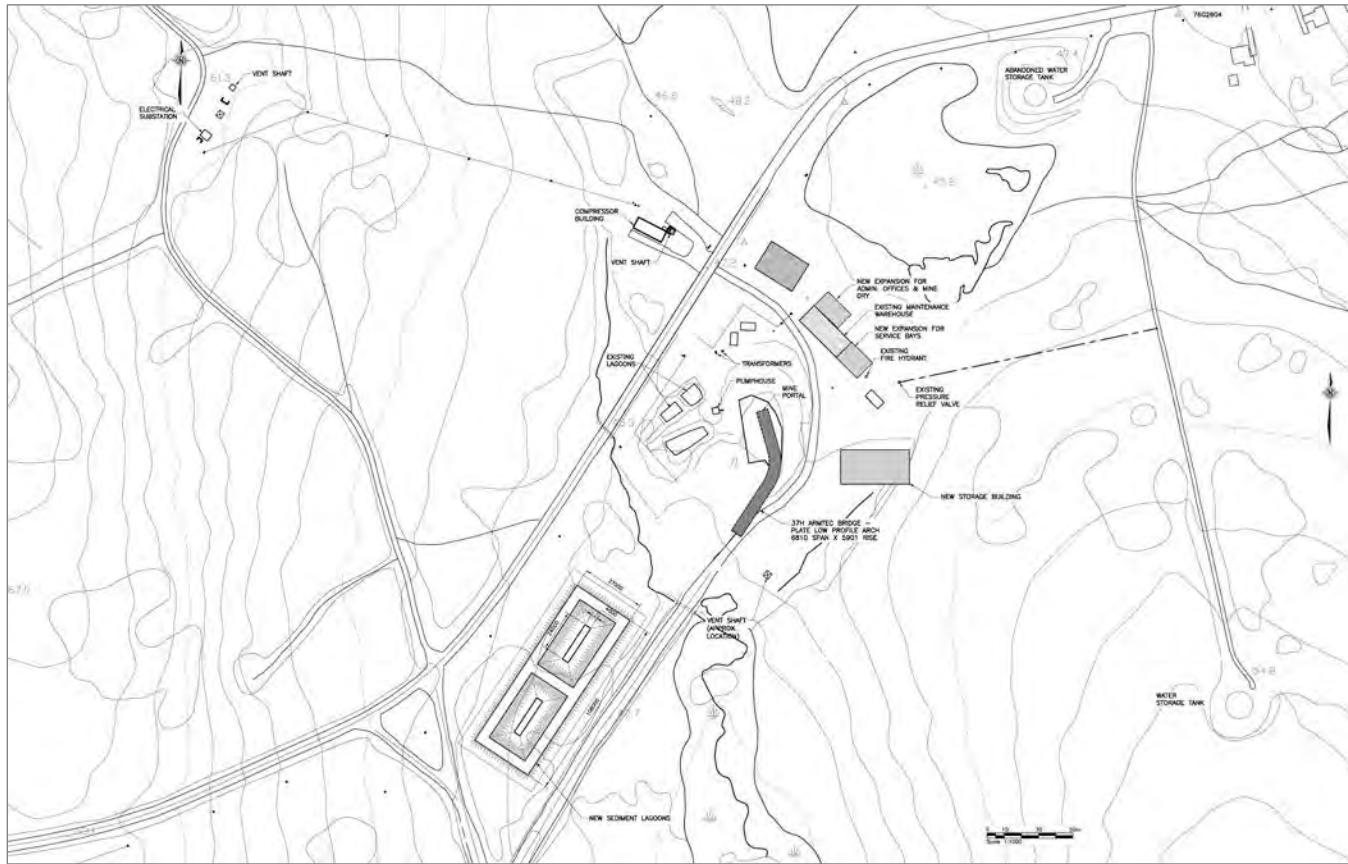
Blue Beach North Proposed Site Layout Plan
